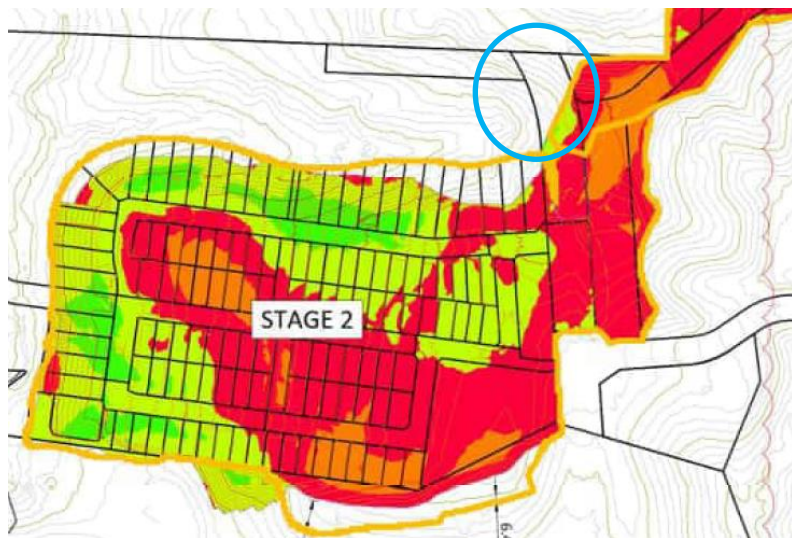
Approved Earthworks Plan (Note: Grand Drive Extension is identified by a blue circle there are no earthworks to facilitate the construction of a road nor a fill batter).
